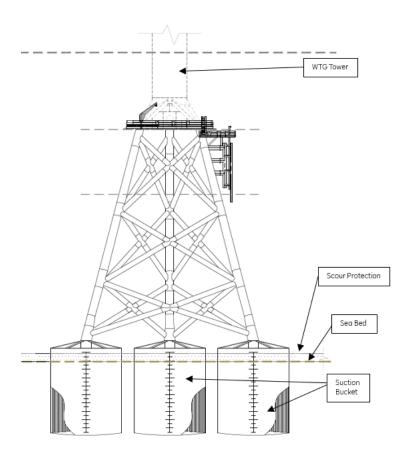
Example of a 3-legged suction bucket foundation supporting a WTG Tower
